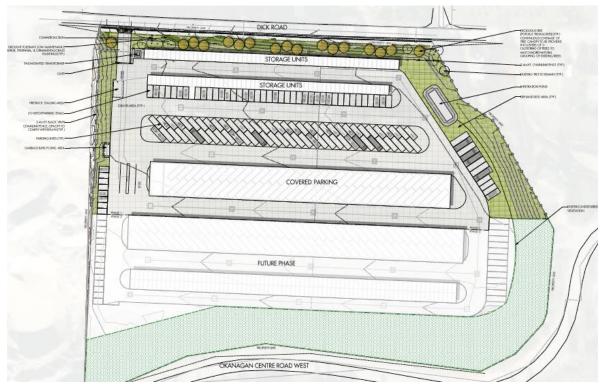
CONCEPTUAL LANDSCAPE PLAN
